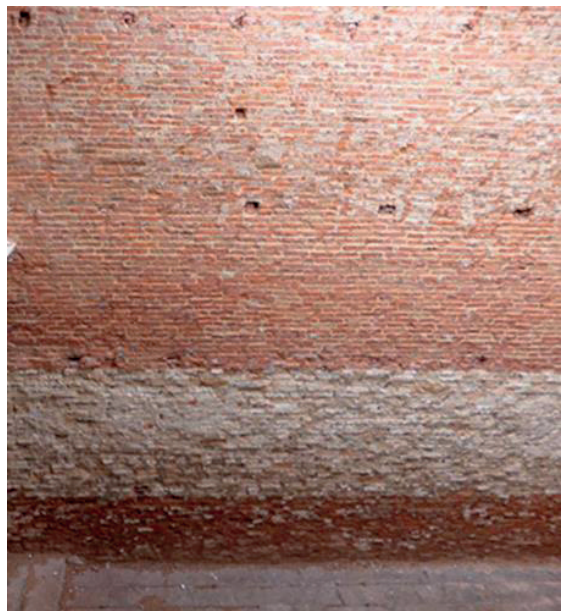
Exposed wall showing clay brick tiles in a shophouse in George Town. Source: Lim Gaik Siang
